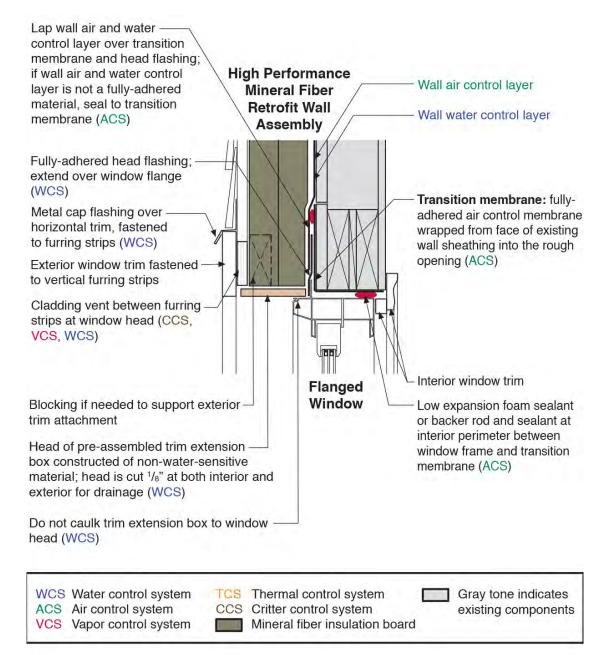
Schematic detail for window head of new window or reinstalled window in a high performance mineral fiber retrofit wall assembly
